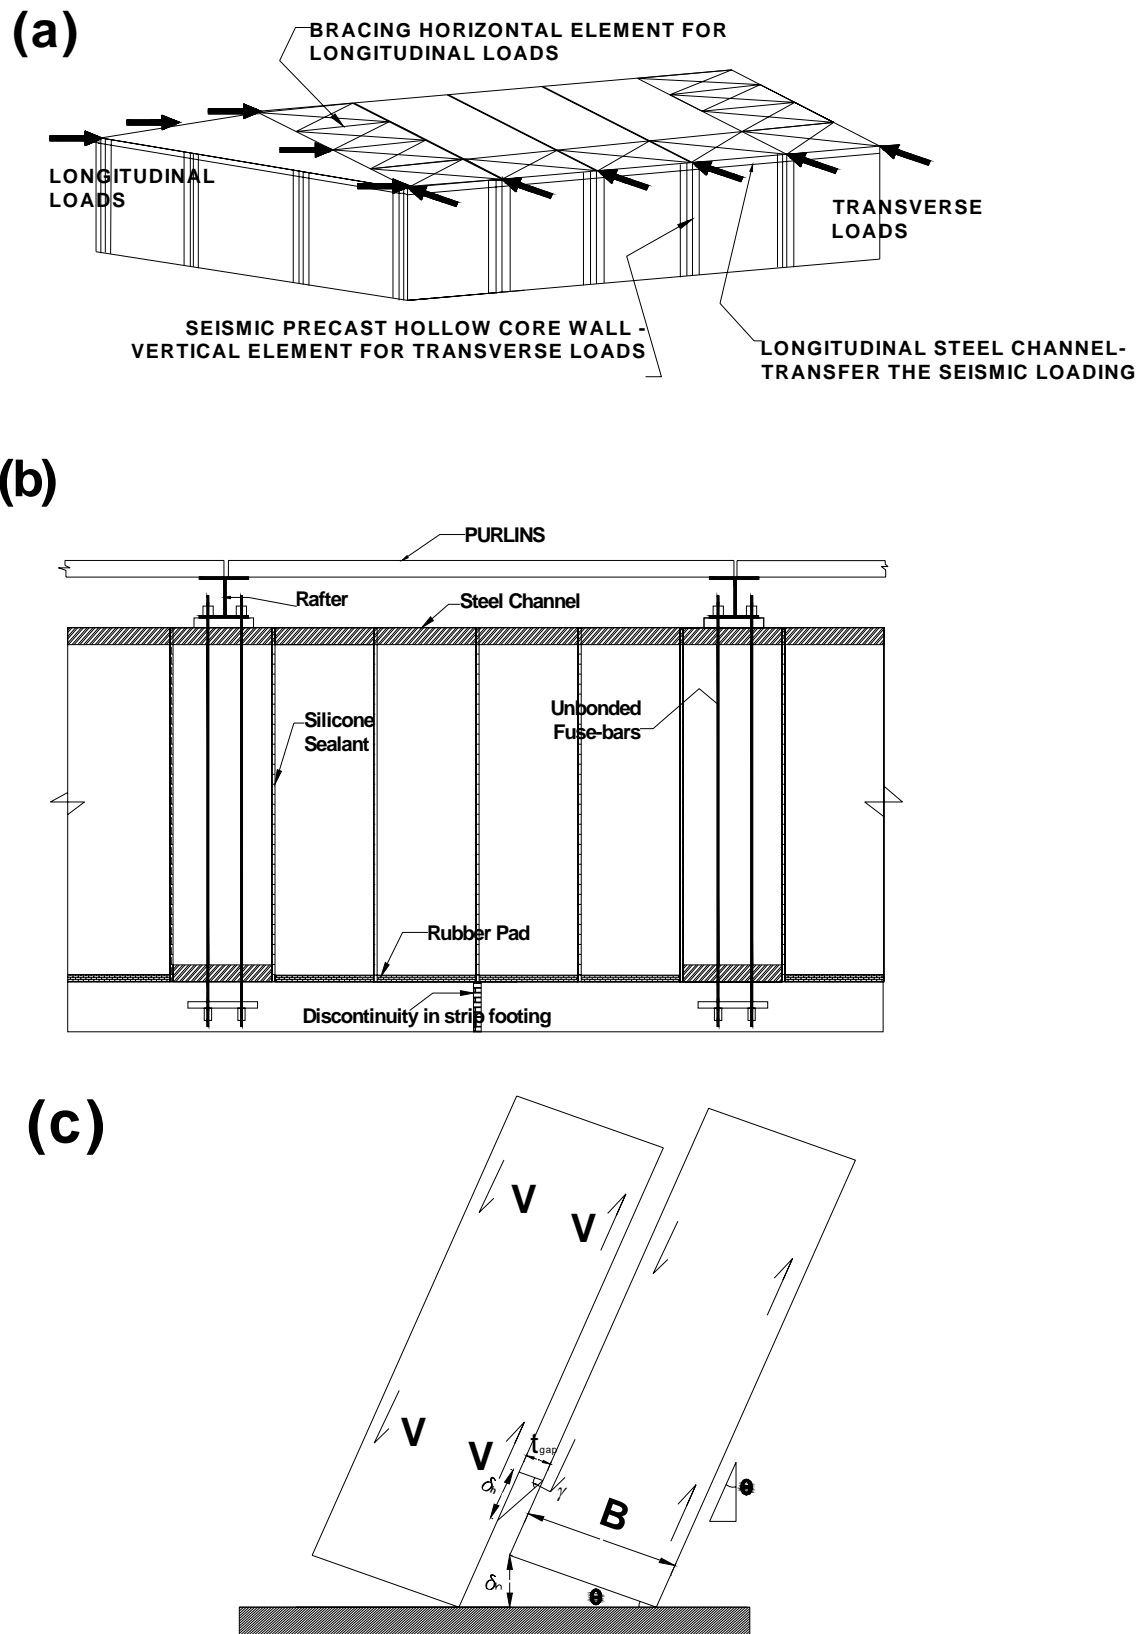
The superassemblage multi-panel wall is represented as part of a prototype warehouse; (a) the isometric warehouse showing the directions of loading and schematic arrangement of seismic walls; (b) side elevation of a multi-panel wall consisting of seismic and non-seismic wall; and (c) the design joint width between the gap of the walls.
